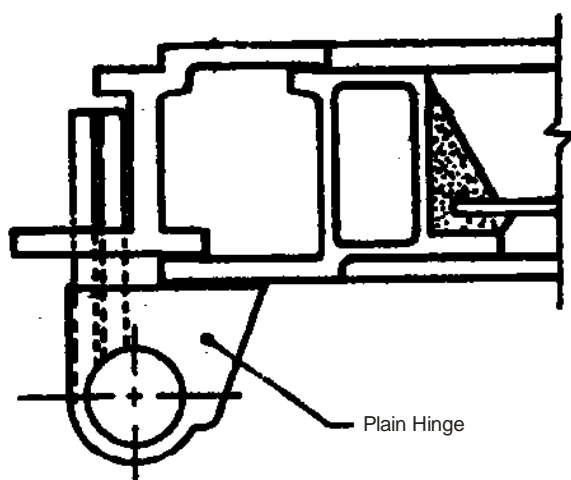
Typical Non-Projecting Type Hinge for Door
